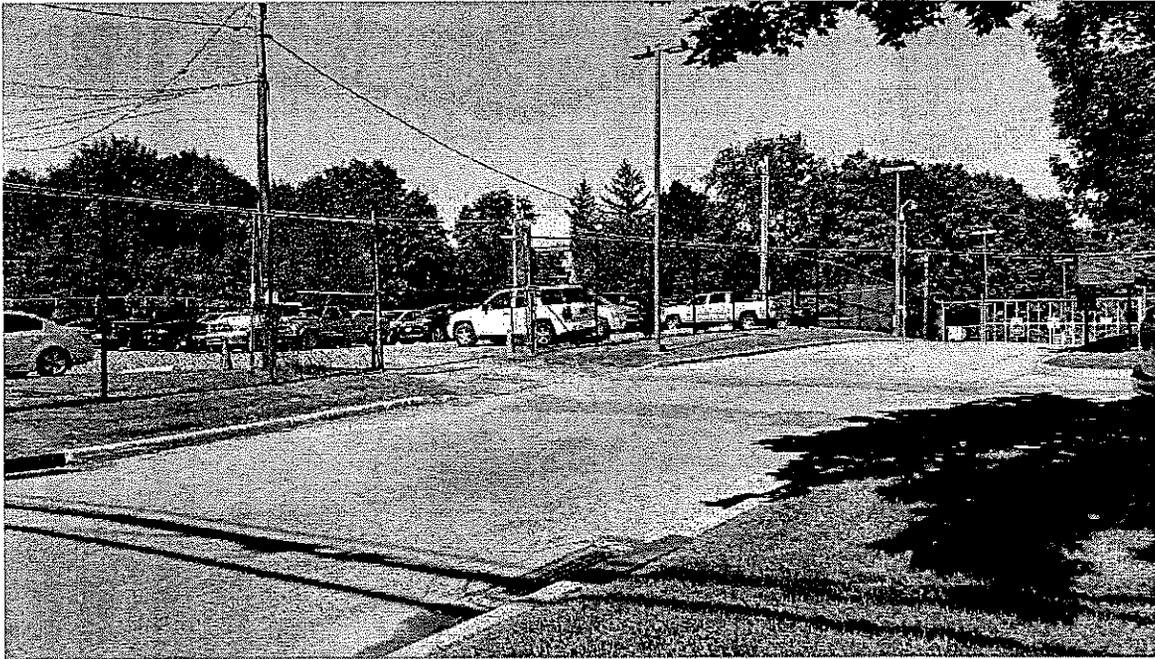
Parking area located in the southern portion of the project area. The gate in right portion of the photo leads to secured areas associated with the correctional facility.
